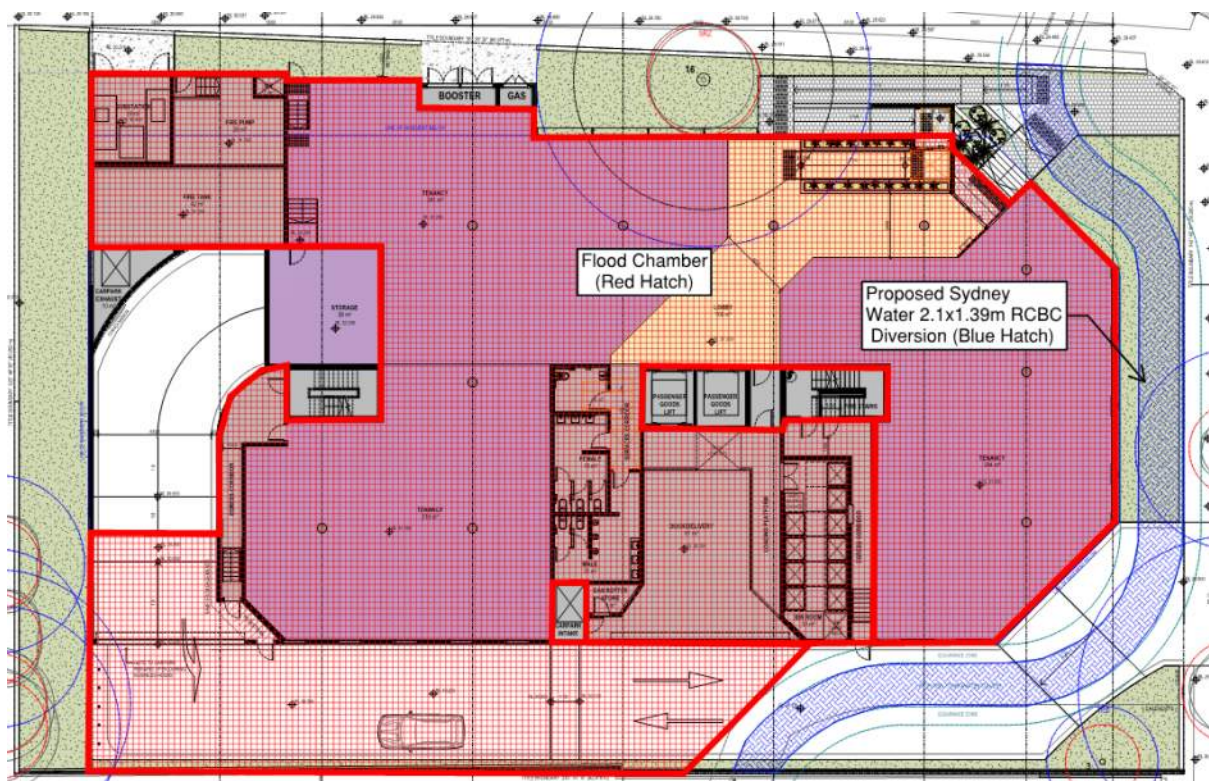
Proposed Ground Floor Plan of the Health Services Facility (refer to Architectural Drawings for Details)
